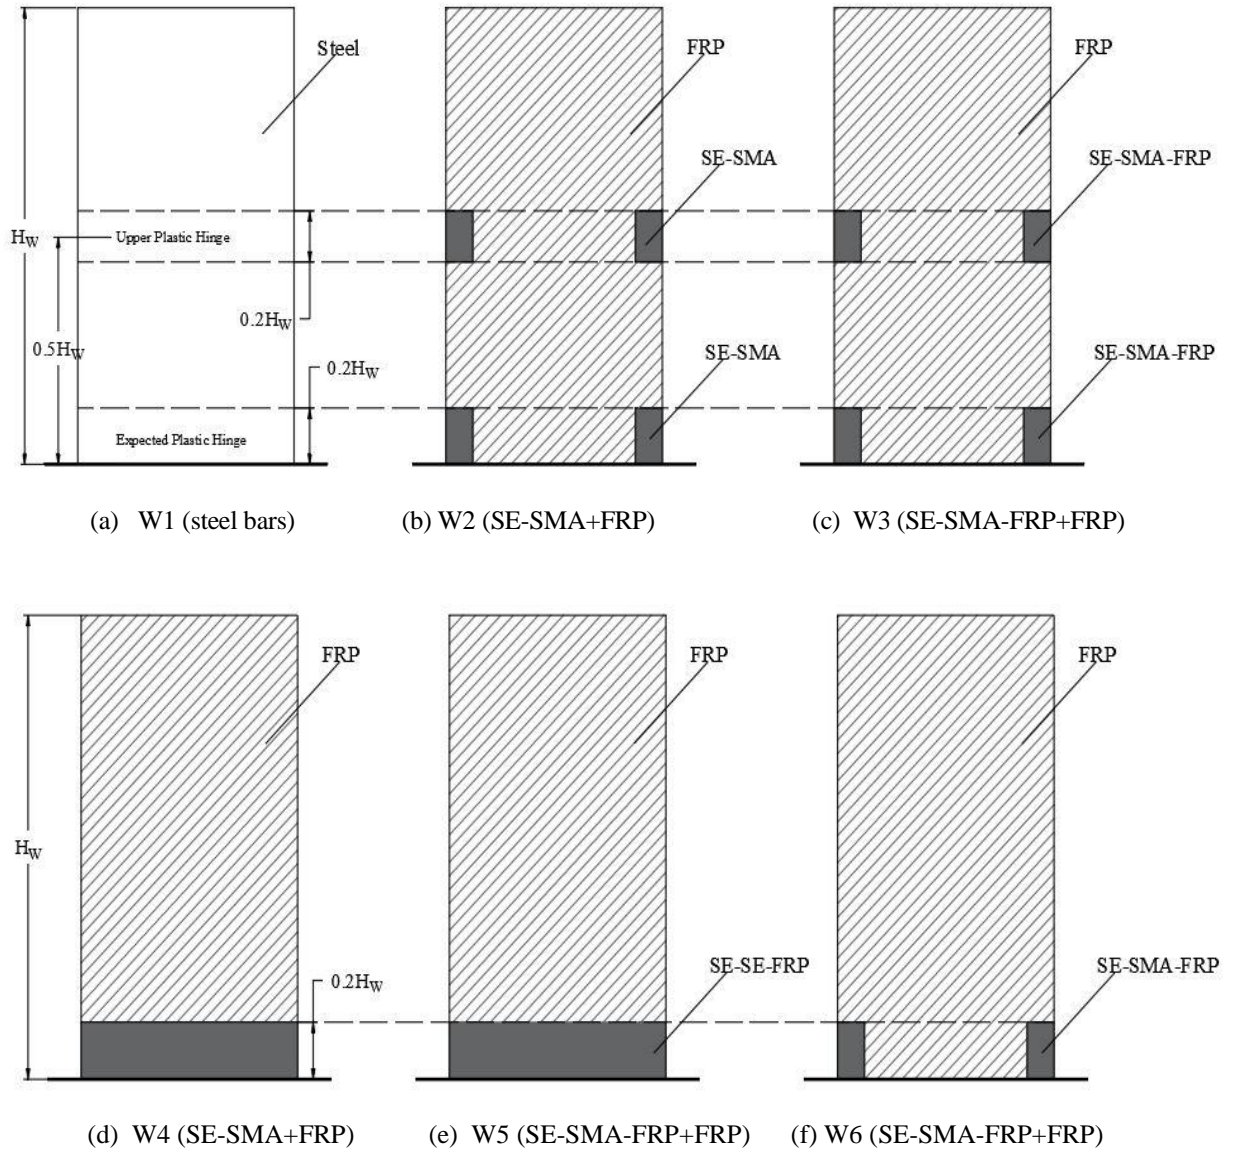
Elevation of the selected walls showing the type of longitudinal bars
